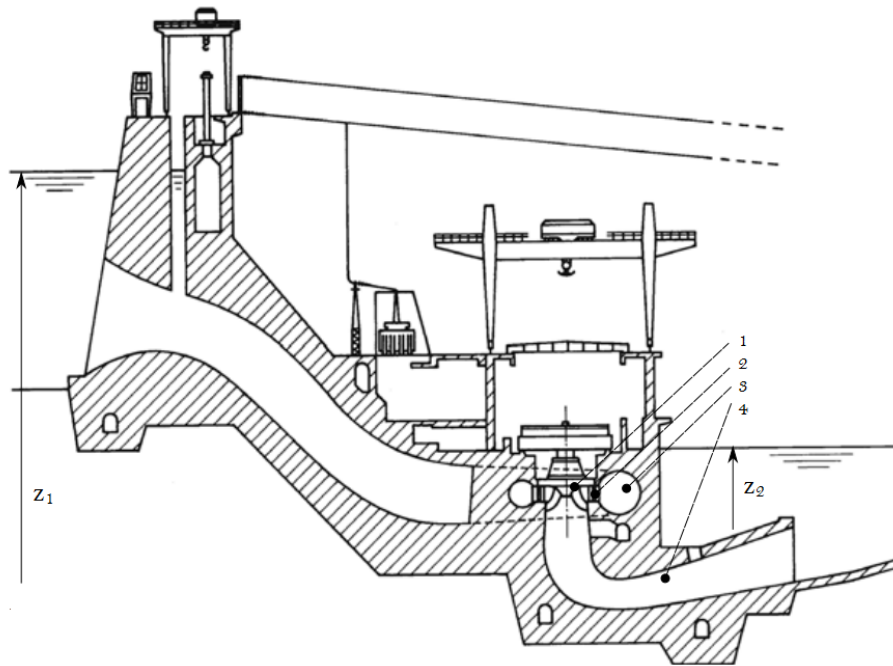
Francis power plant, (1) Francis runner, (2) distributor, (3) spiral casing and (4) elbow draft tube [15]
